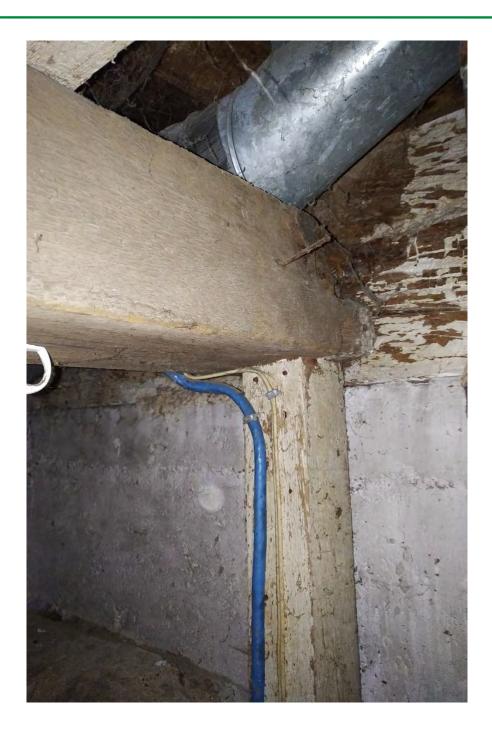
End of central wood beam, noted to be rotted (174 Victoria St)
